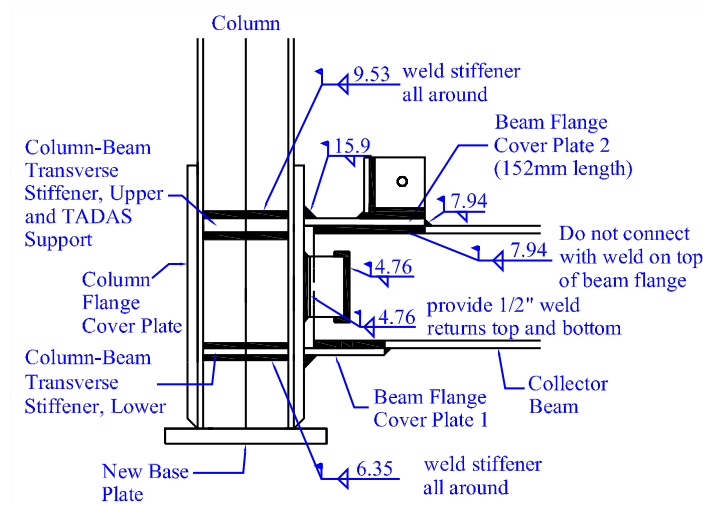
Column Base Modifications (weld dimensions, mm)
